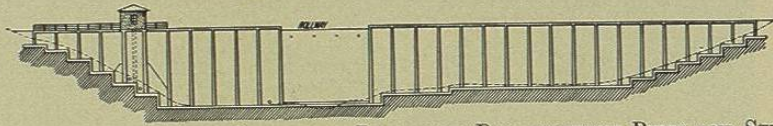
LONGITUDINAL SECTION OF PITTSFIELD DAM, SHOWING PIERS AND STEPPED FOOTINGS ON SLOPES.
